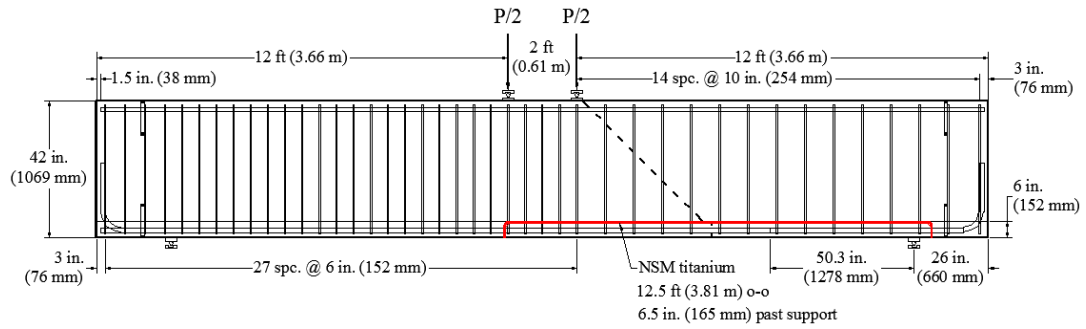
Elevation of specimen IT.45.Ld3(10).Ti
